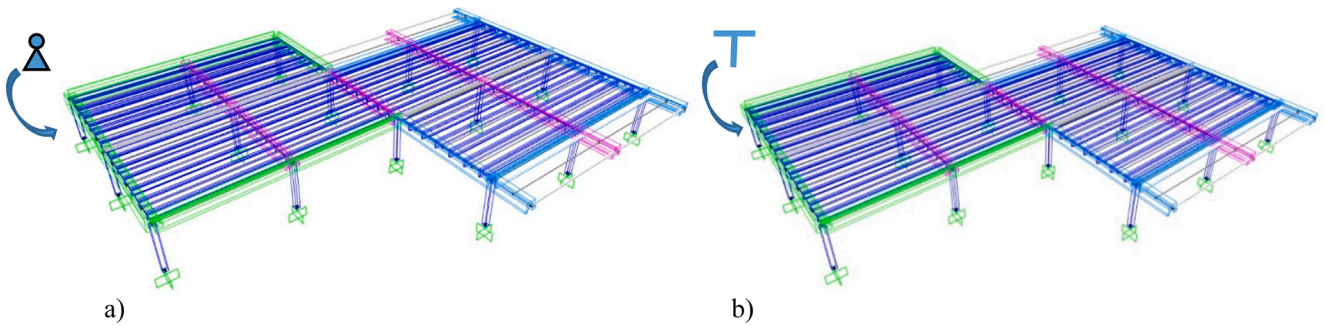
View of the finite element model of the HT- (a) and FT- (b) structure, differing for the roof beam-to-column connections.
